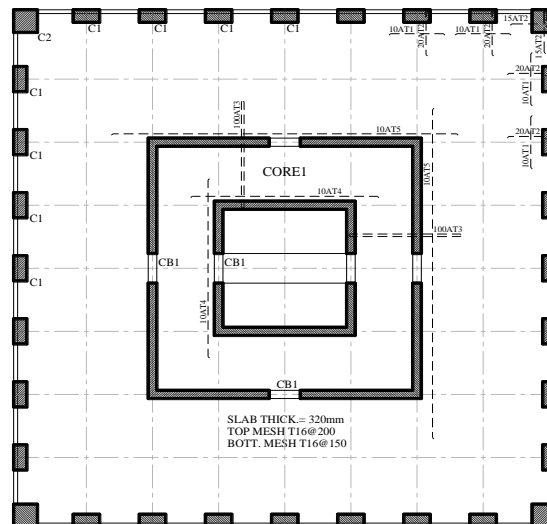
Typical reinforcement details of floor slabs - 80 and 100St buildings
